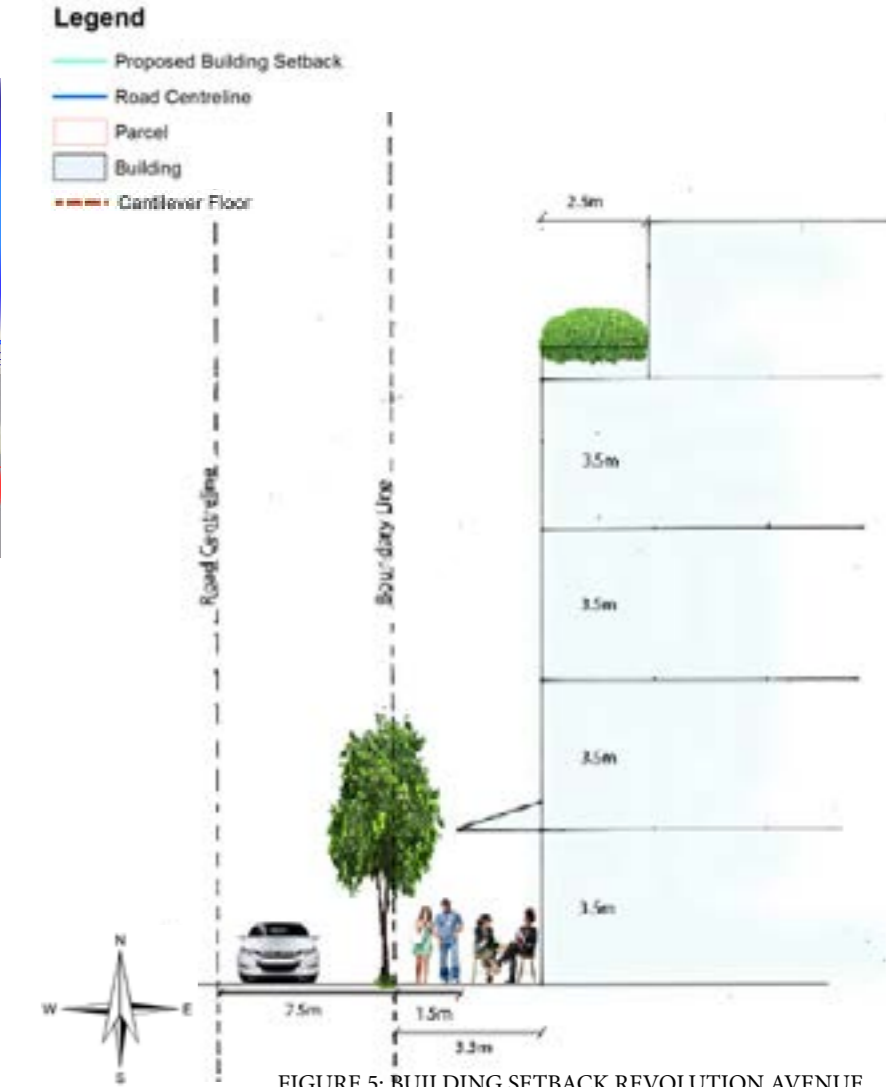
BUILDING SETBACK REVOLUTION AVENUE
